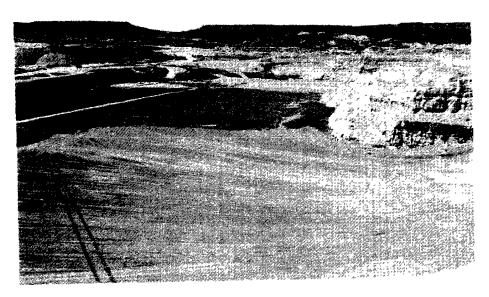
North Paguate Pit (looking west/southwest) showing shale and topsoil cover.
